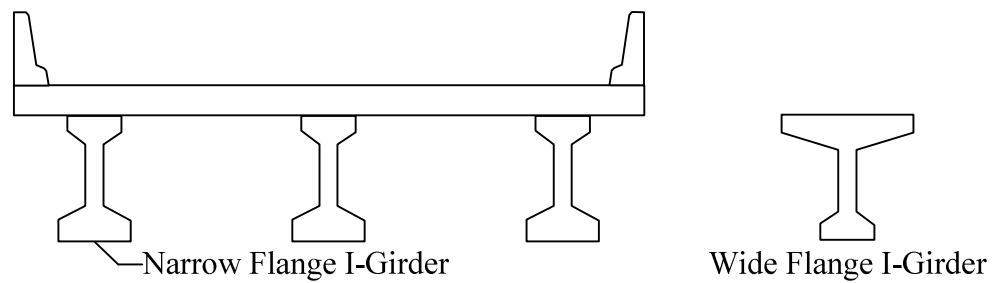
PS CONCRETE I-GIRDER (NARROW OR WIDE TOP FLANGE)
